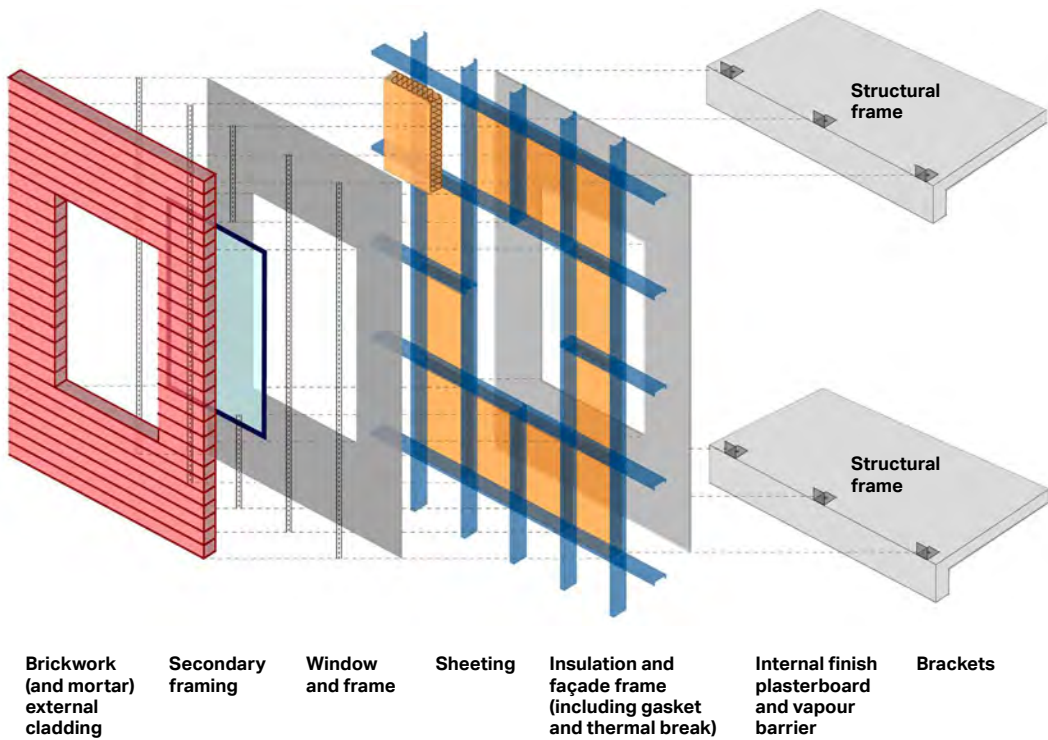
Brickwork masonry wall – steel frame system (WT-15)
